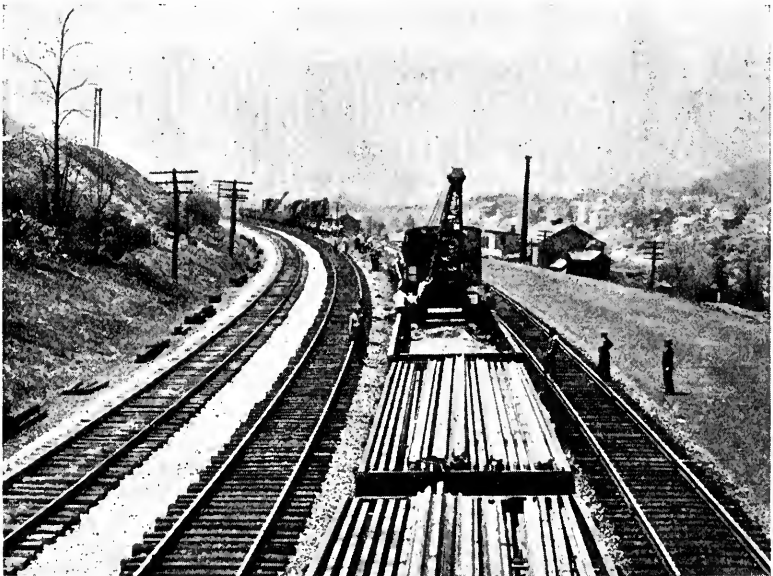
PENNSYLVANIA RAILROAD LAYING RAIL WITH THREE NO. 3 NORTHWEST CRANES, BOLIVAR, PA.
